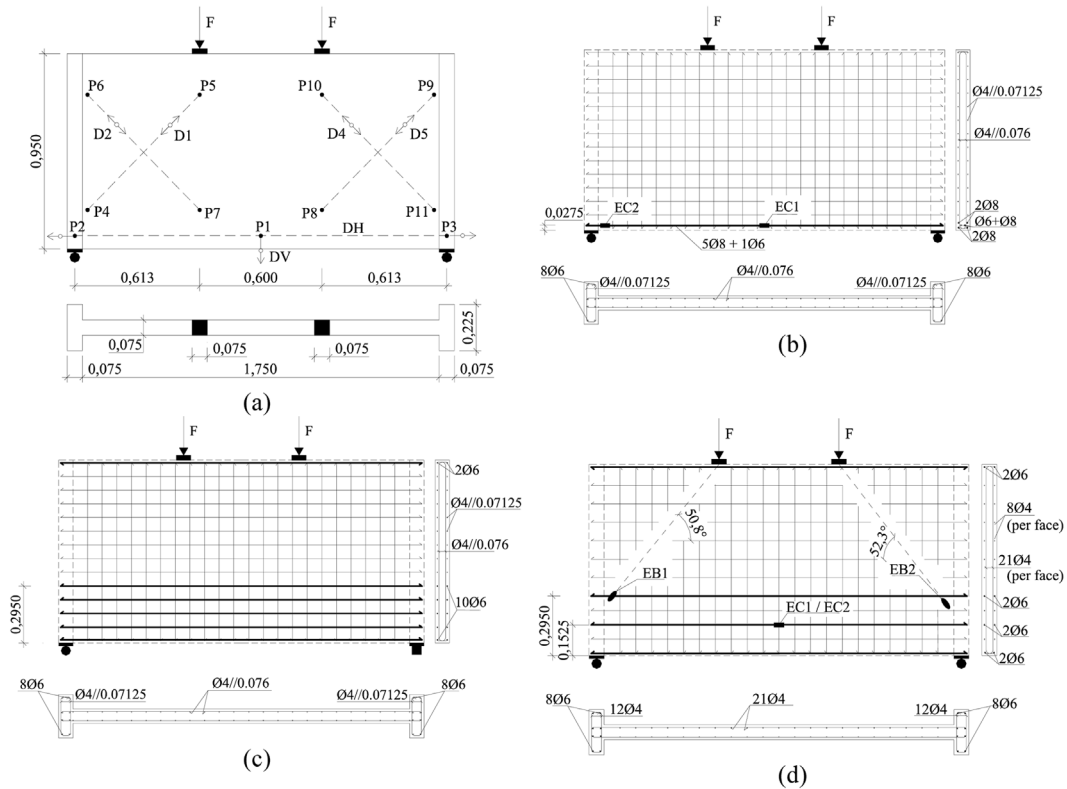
(a) Dimensions of the tested specimens; (b) Reinforcement plan of model M1; (c) Reinforcement plan of model M2; (d) Reinforcement plan of model M3 (without the pre-stressing wires)
